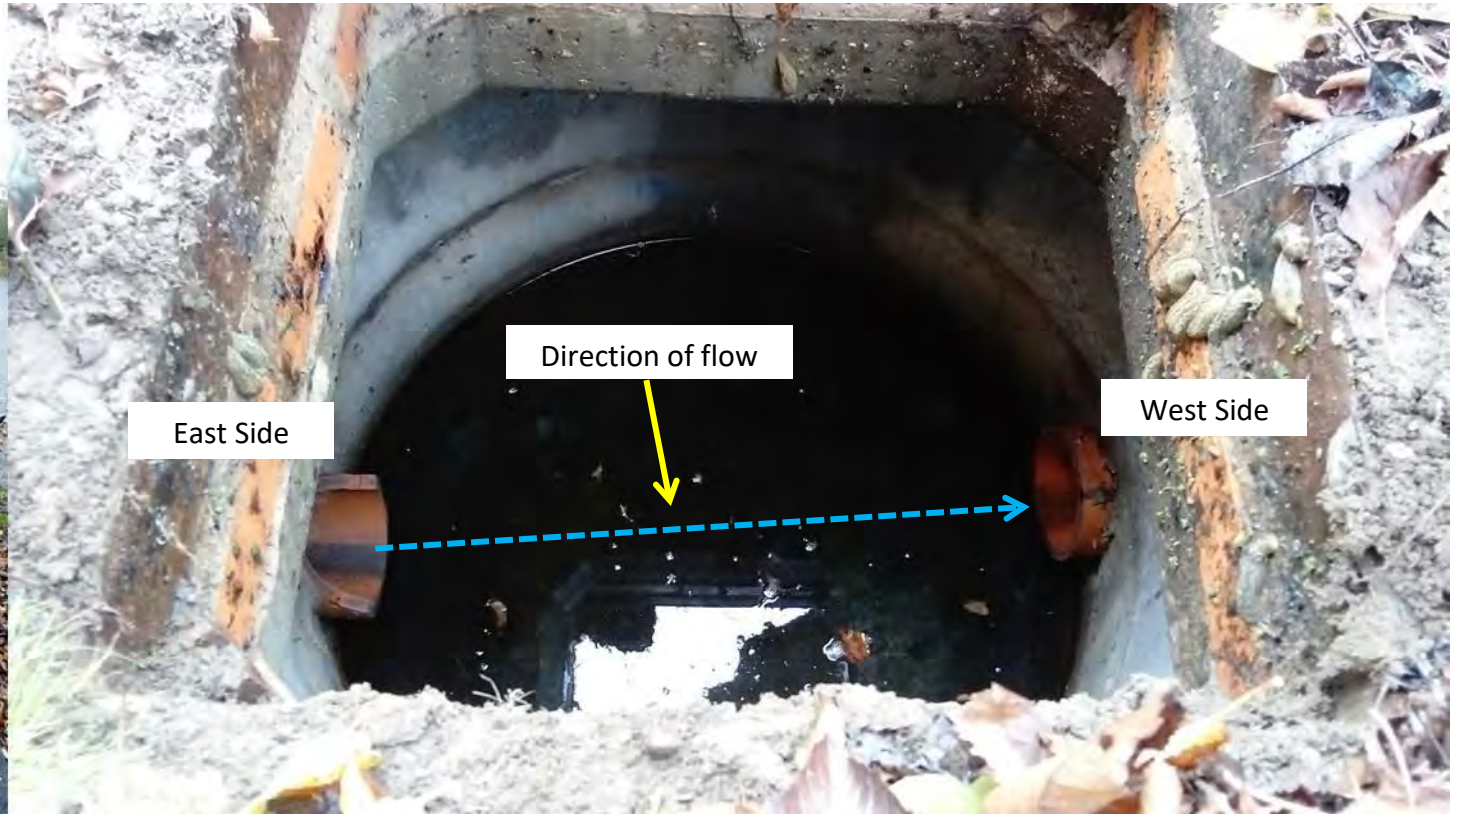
Manhole for surface water drainage at depicted in Photo 1. No outlet pipe identified, incoming pipe from the north.
